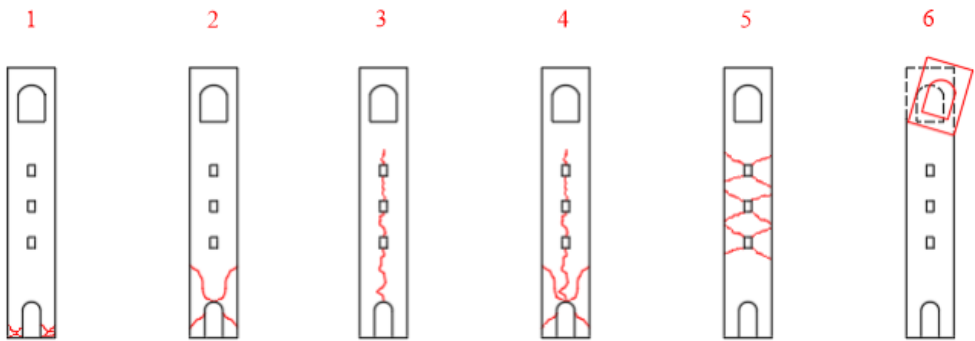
2– Sketch of the main recurring damage modes recognized from the analysed masonry towers models: 1) Basement level damage; 2) Diagonal failure; 3) Vertical splitting; 4) Mixed diagonal failure and vertical splitting; 5) Inclined cracking at the minor openings; 6) Belfry collapse.
